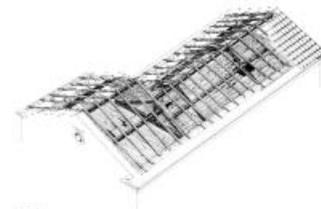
The "Marketi" Mansion. Isometric construction plan of the roof.
